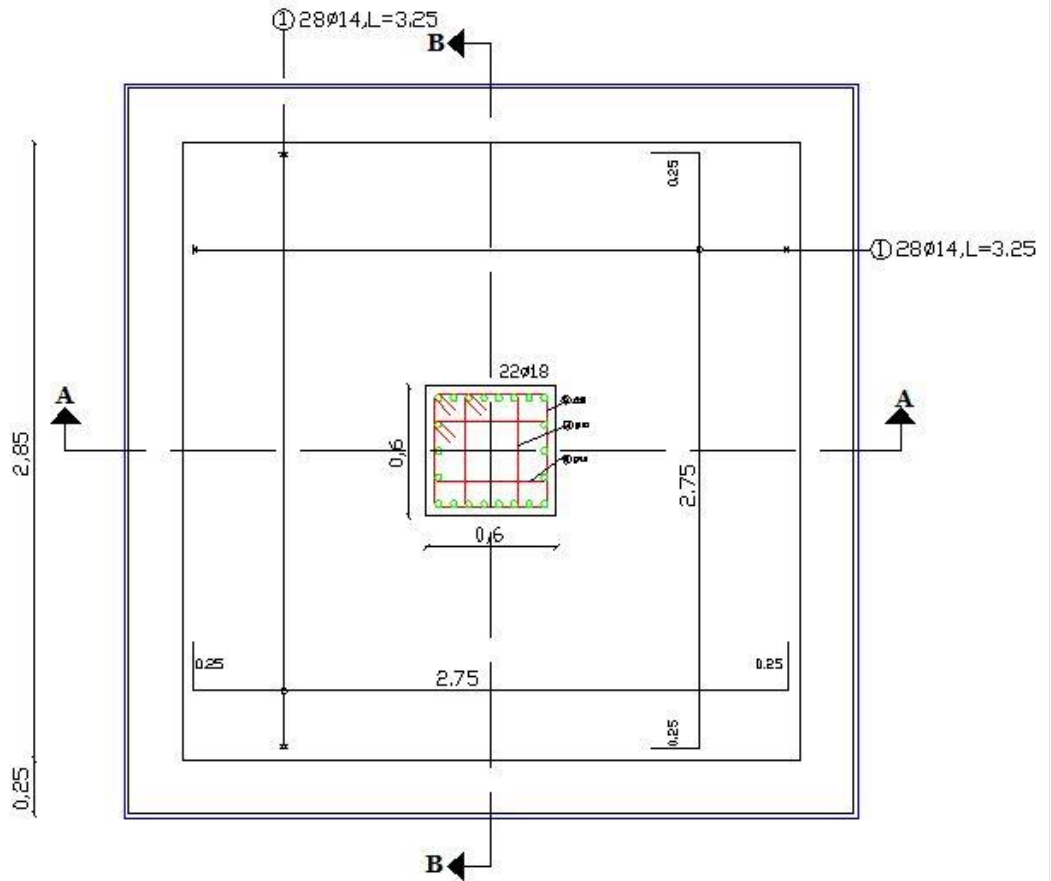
Detail of Isolated Footing (F9)
